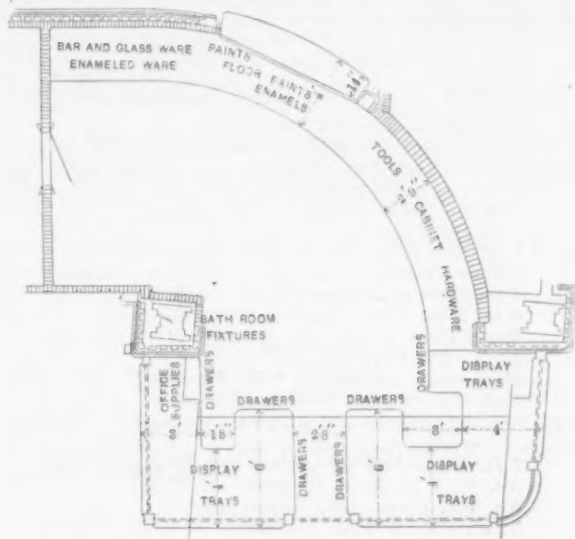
Floor Plan of Hardware Booth, with General Arrangement of Goods Indicated.
